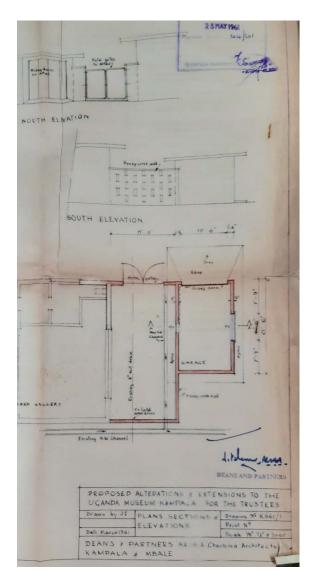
Proposed alternation & extension to the Uganda Museum, detail showing the garage. Plan by Deans & Partners ARIBA Charted Architects Kampala& Mbale, 21.11.1963 (Kampala Capital City Authority Archive)
